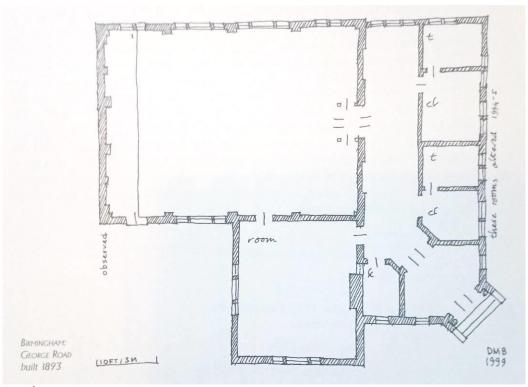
Ground floor plan Edgbaston meeting house, as reconstructed by Butler (north at the top, not to scale) (Butler (1999), vol. 2, p.626)
